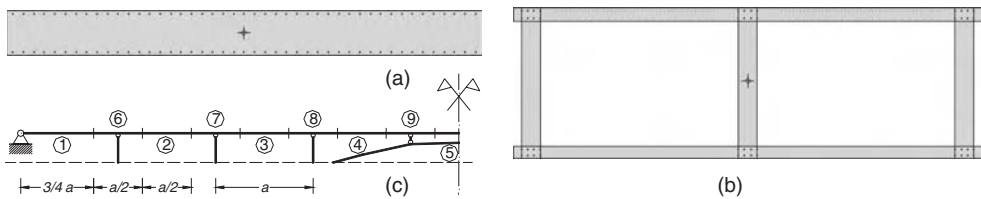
Details of the cross-sections. (a) Arch. (b) Beam. (c) Beam subdivision (see Table 1).
